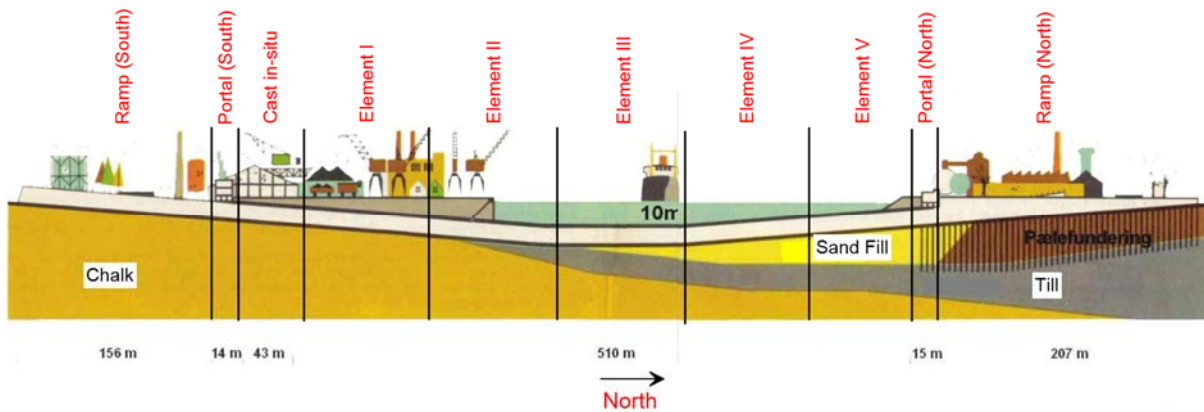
Longitudinal section of ramps, portal buildings, cast-in-situ tunnel and the five immersed tunnel elements.
